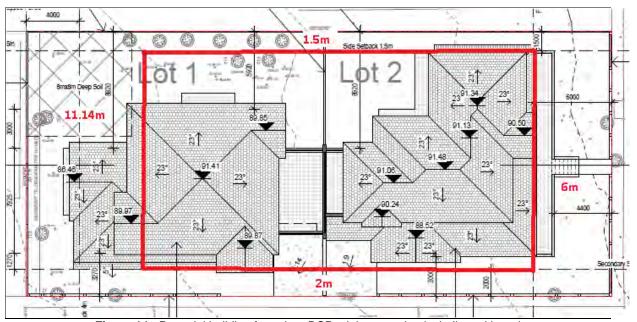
Potential building footprint - DCP minimum setbacks indicated in red
